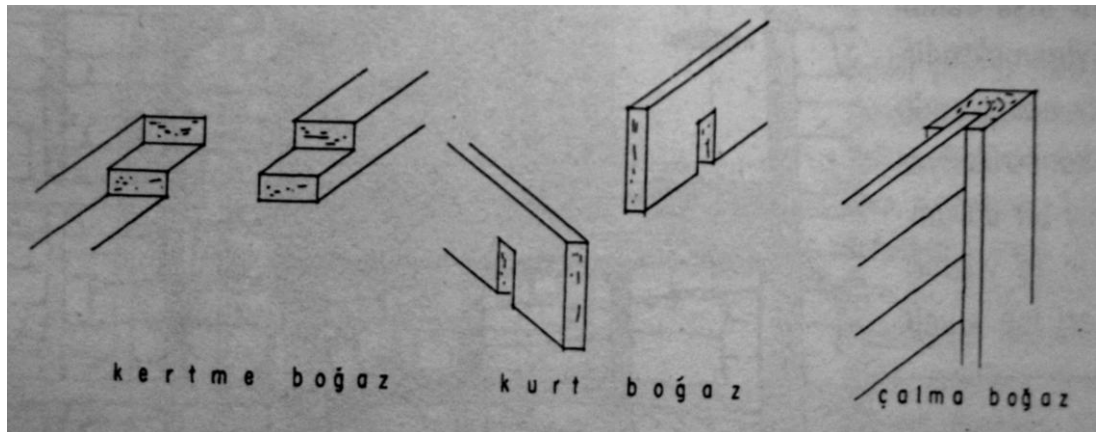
, Types of Tongue and Groove Joint Construction Technique (Özgüner, 1970: 30)
